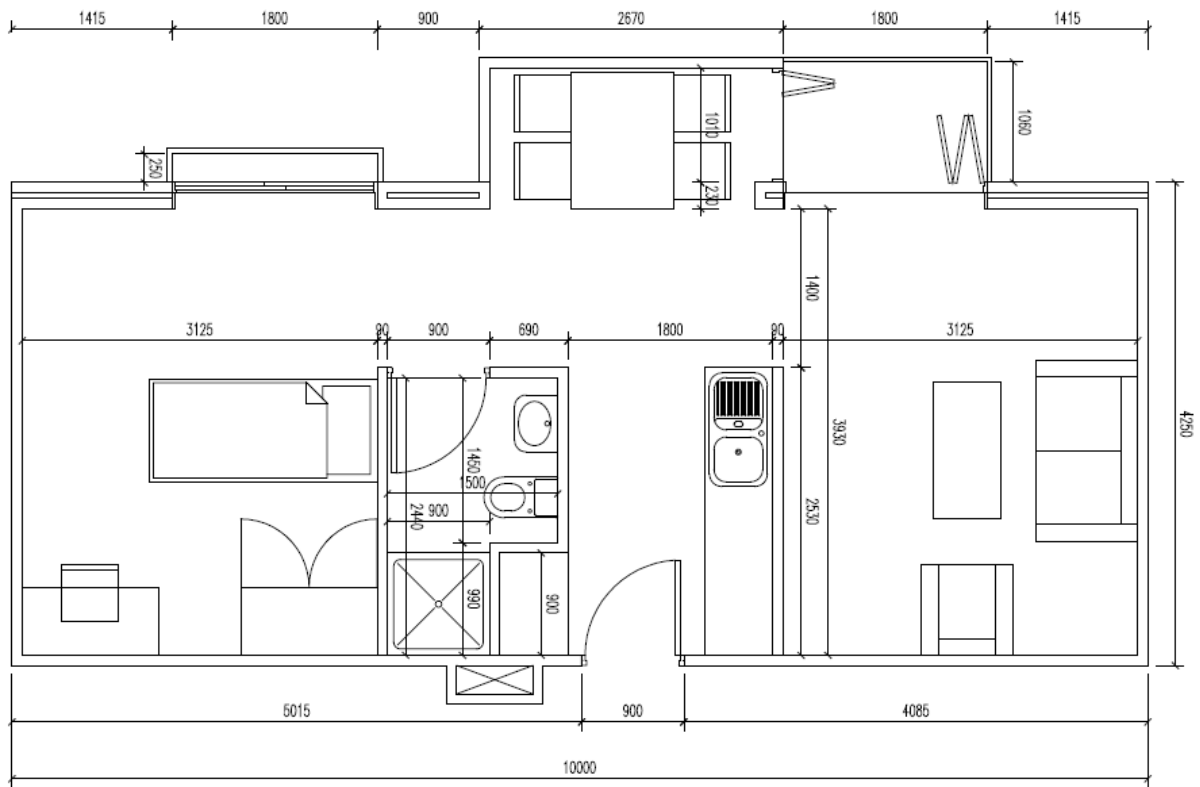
Example of floor plan of offsite precast, modular designed housing units. (Fitzhenry, 2010).
